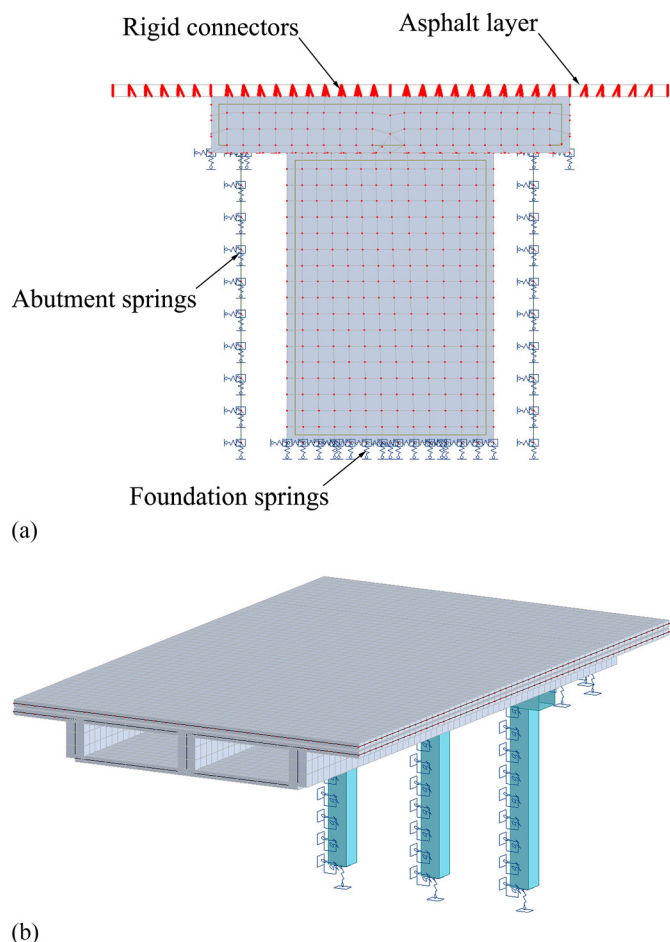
Cross sections through the Z-24 Bridge model: (a) asphalt layer detail; and (b) deck detail.
